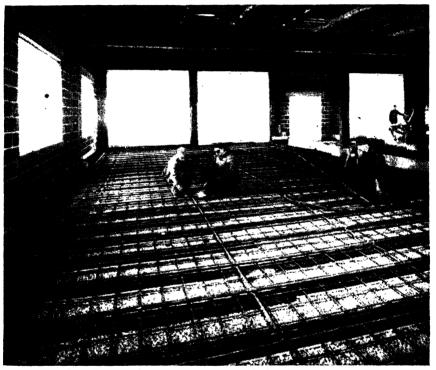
Installing steel pipe coils for radiantly heating a firehouse. (Bethlehem Steel Co.)
